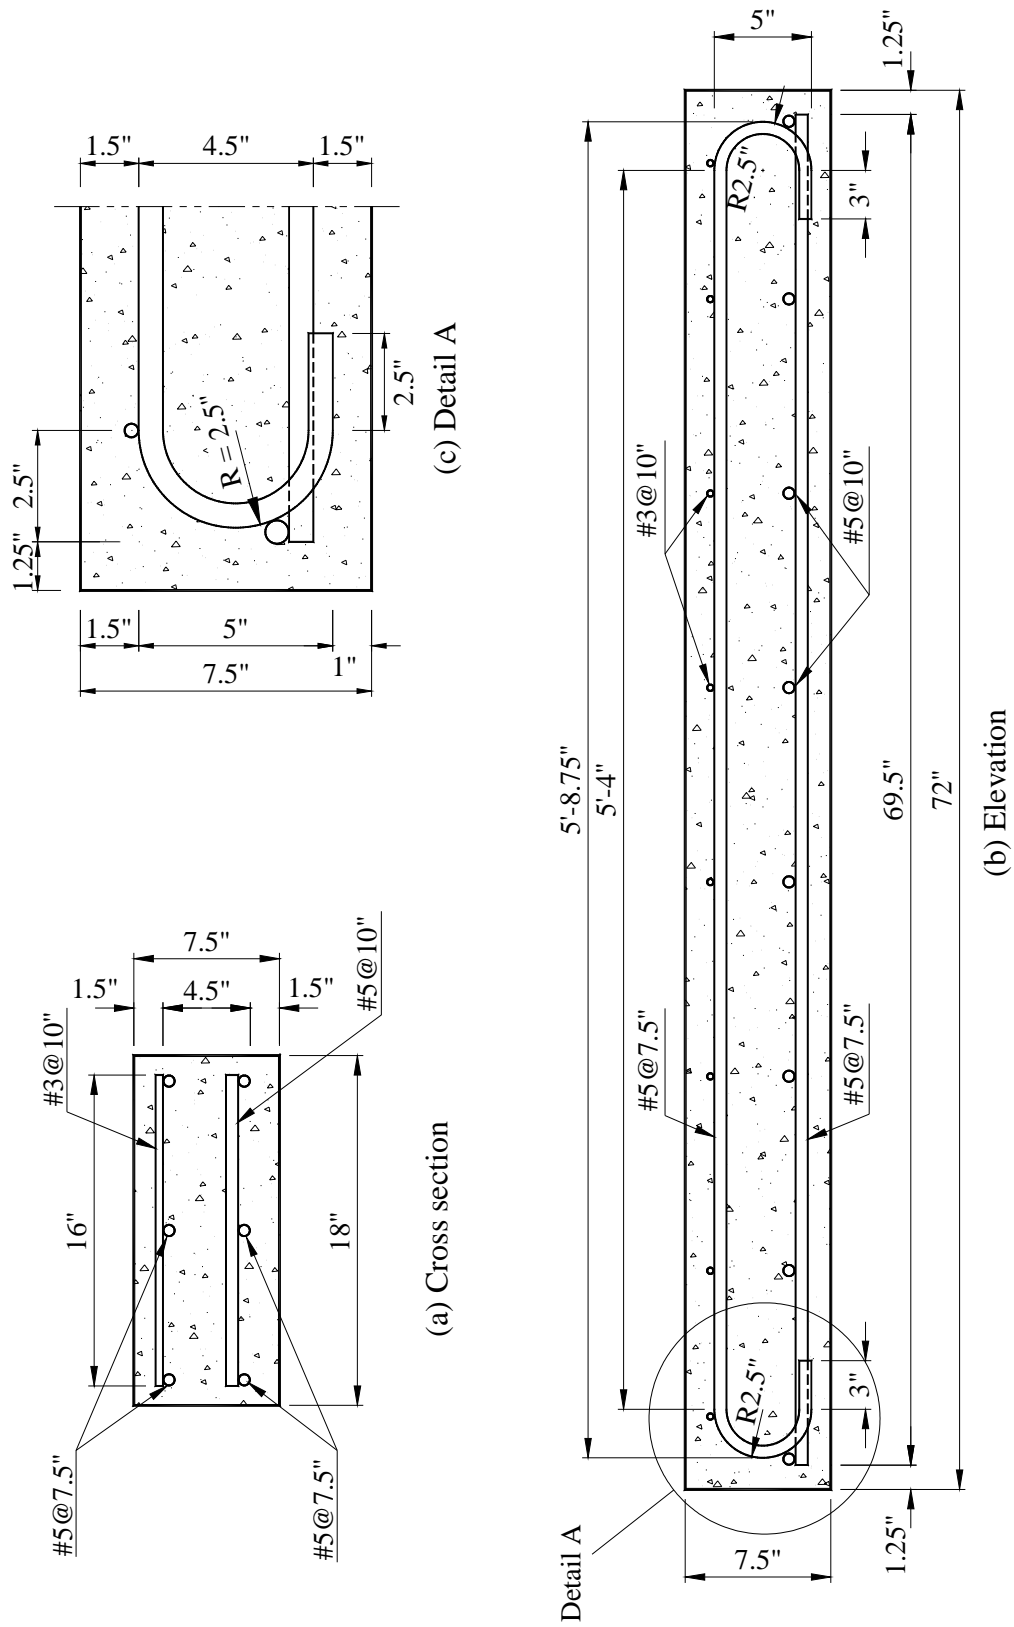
Dimensions and reinforcement details for specimens without SIPMF
